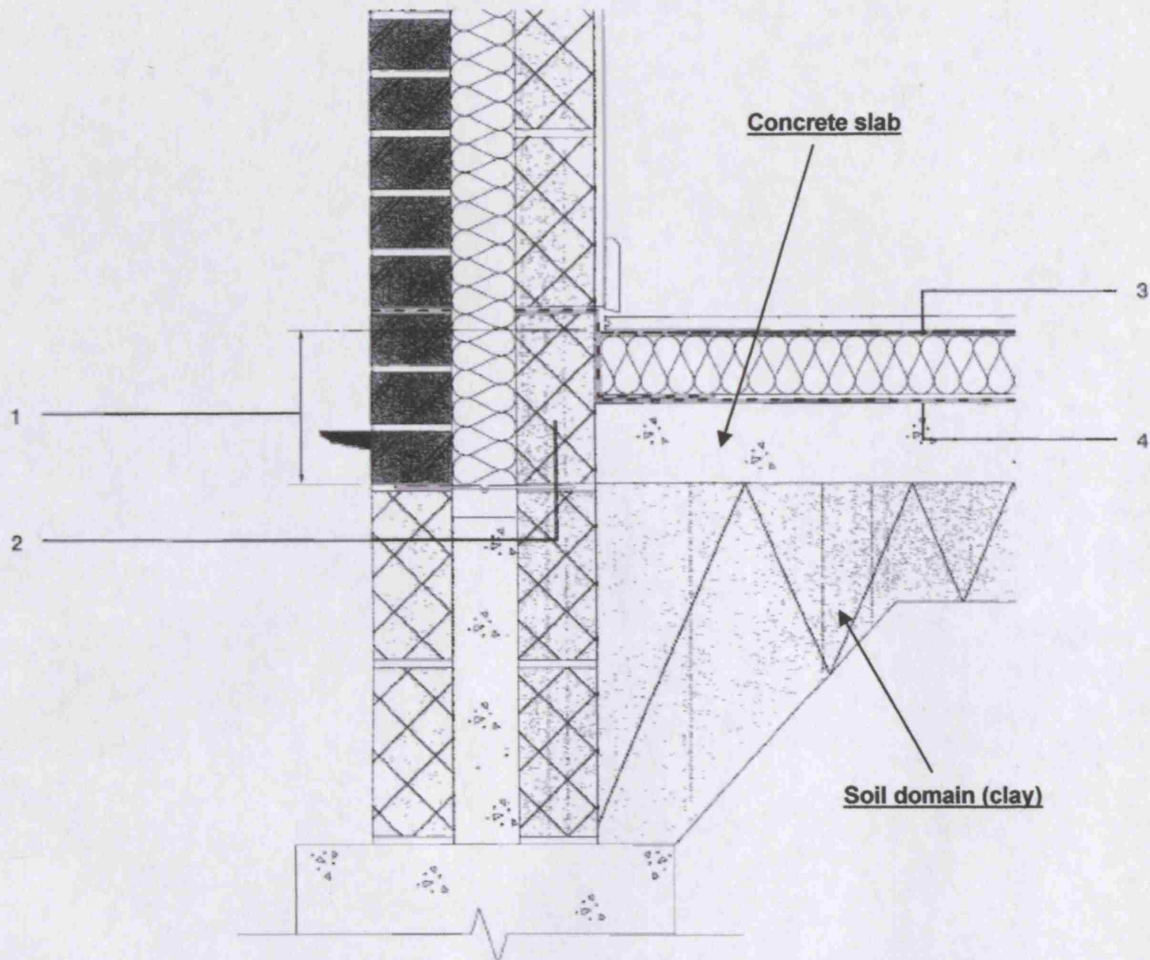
Constructional detail of the full-fill cavity wall [83]
